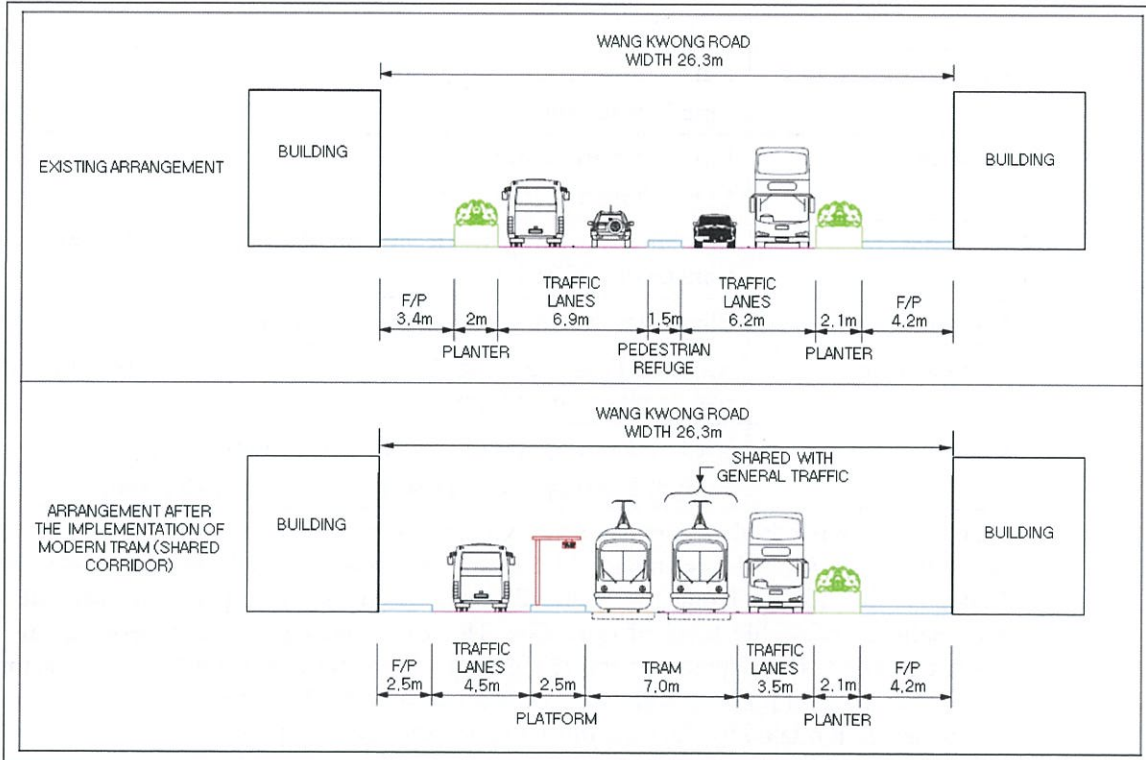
Typical Cross Section Plan of Option 2 (At-Grade Shared Corridor) on Wang Kwong Road (Before and After Implementation)
